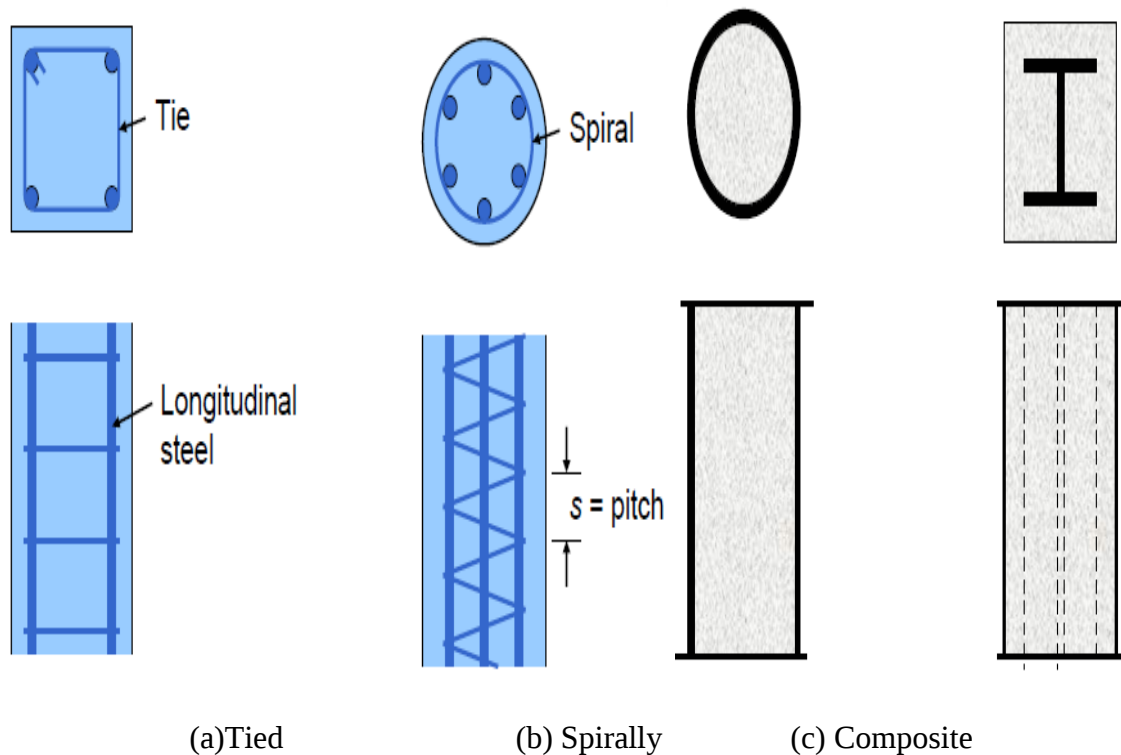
Reinforcement Kinds for Concrete Columns [9].
